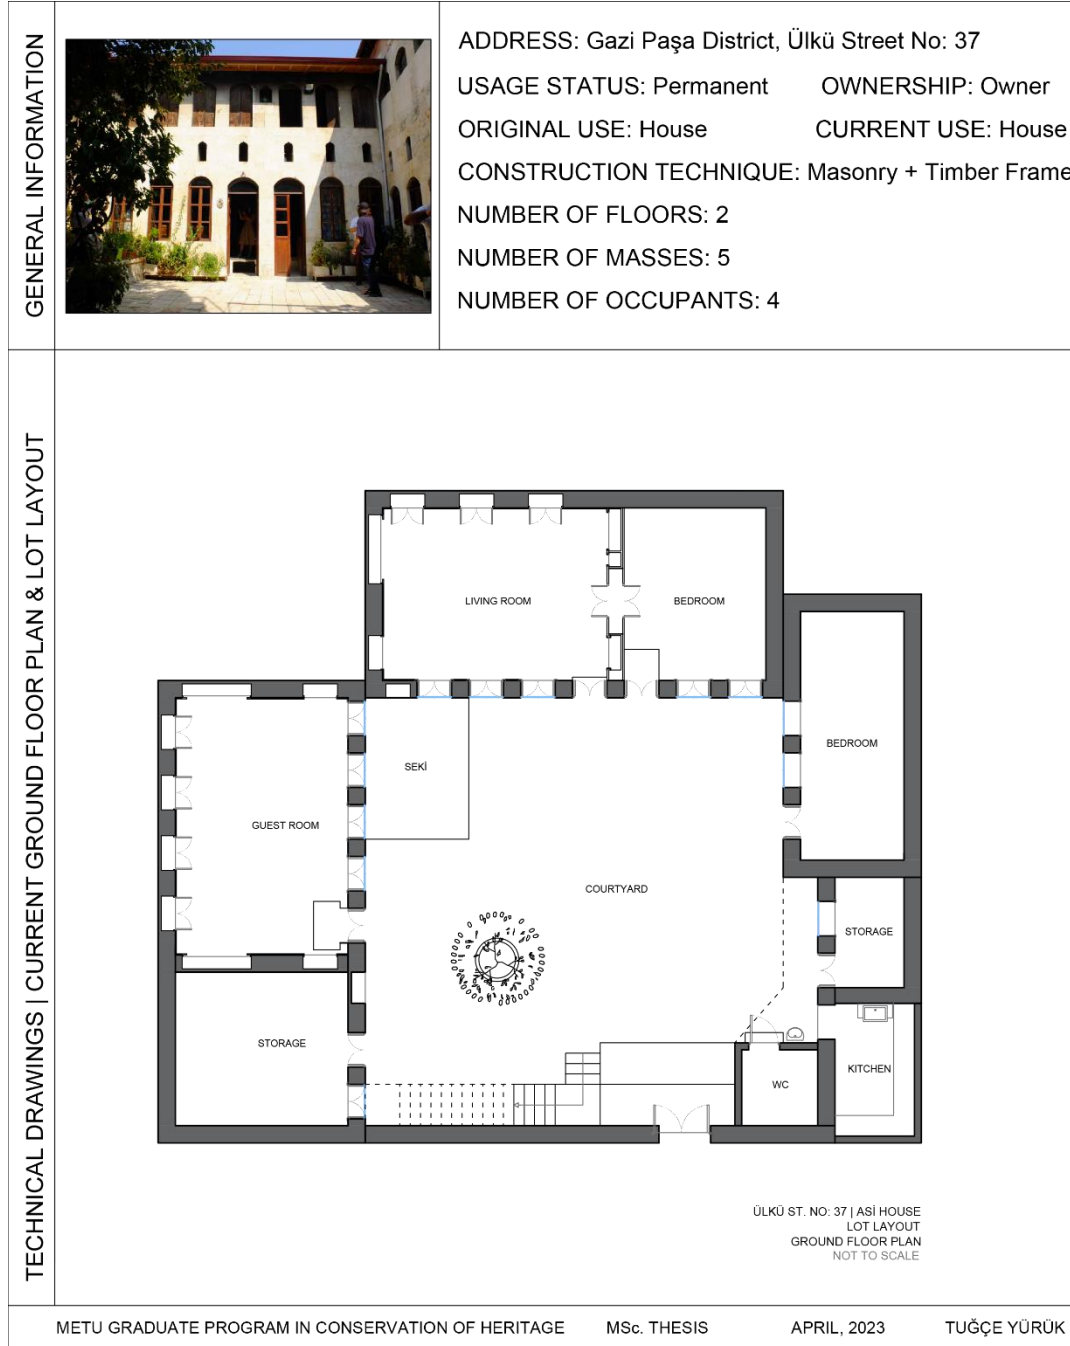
Current ground floor plan of Asi House (Author, 2022)
